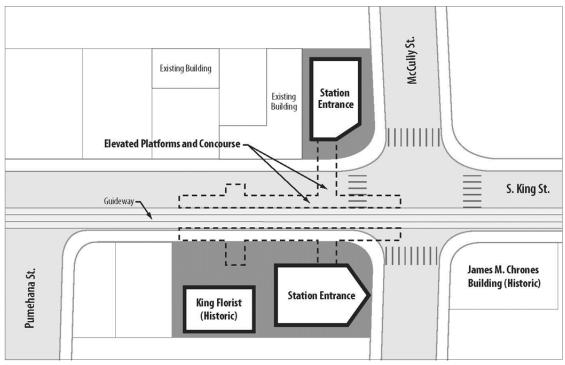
Beretania Street Tunnel Alternative McCully Street Station
